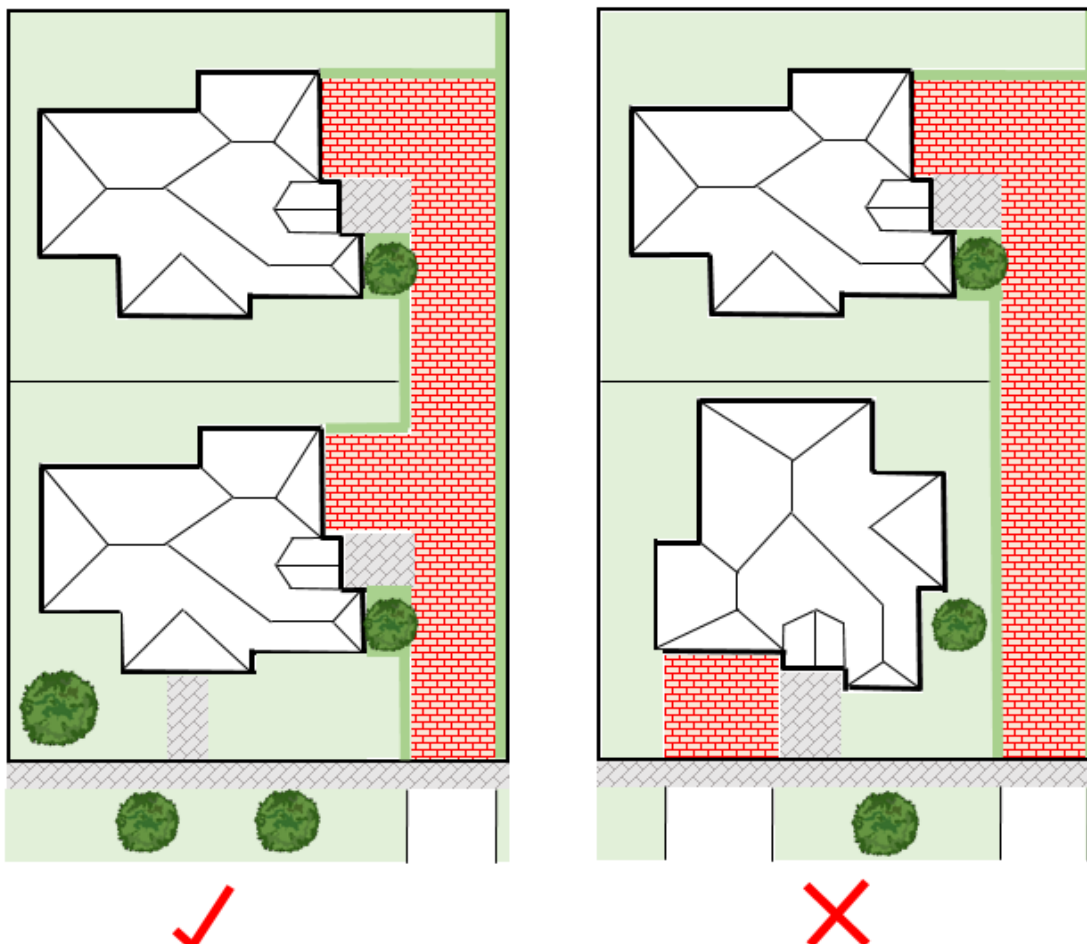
Vehicle access to Dwellings in a Front to Rear Arrangement
